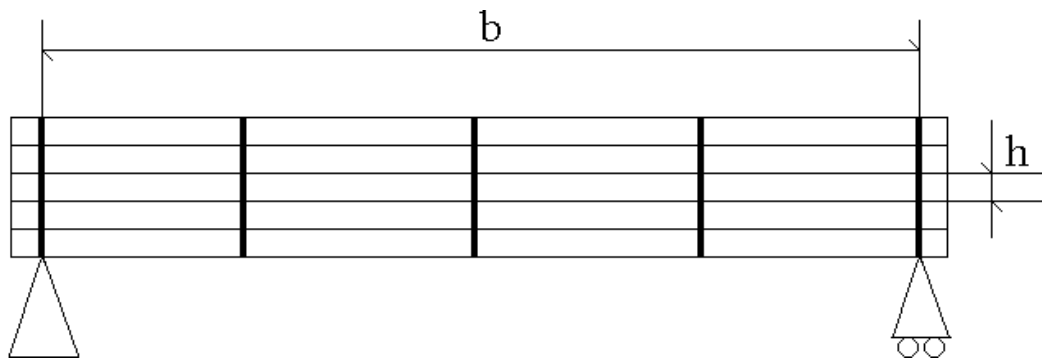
b Beam bending strength and stiffness with bolting
